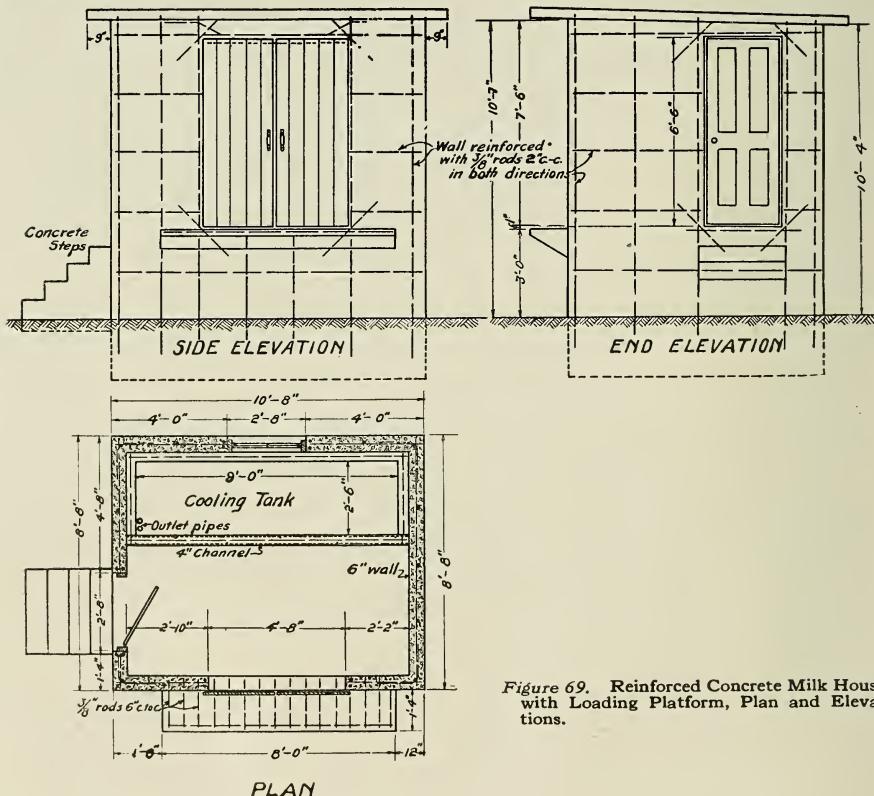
Reinforced Concrete Milk House with Loading Platform, Plan and Elevations.
